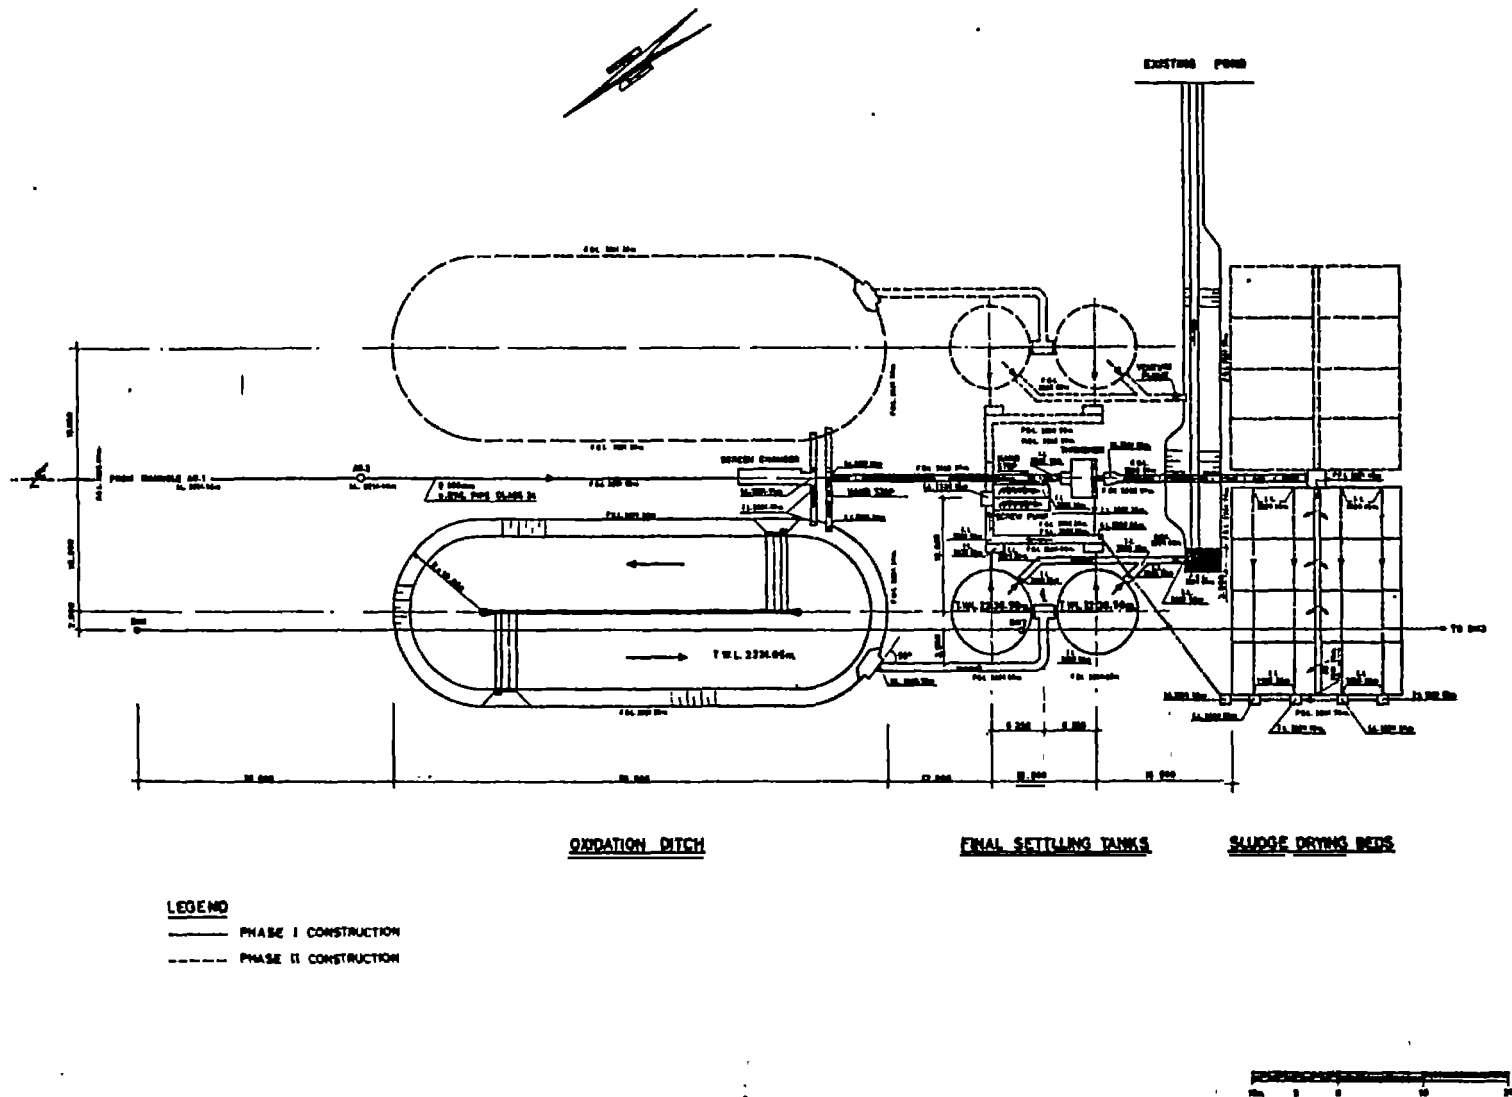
General layout of the treatment plant, excluding natural pond (Gauff... 1978).
